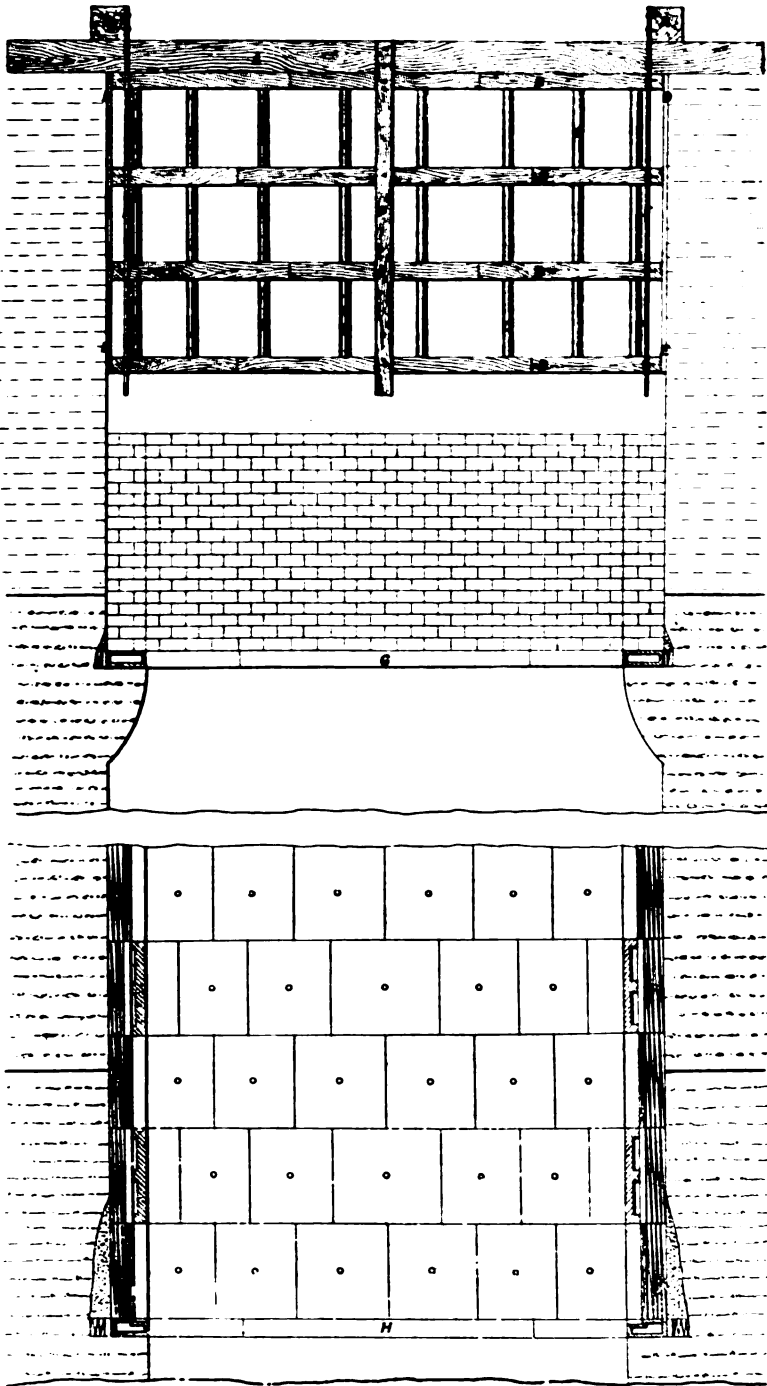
TIMBERING, WALLING, AND TUBING IN A SINKING SHAFT.
